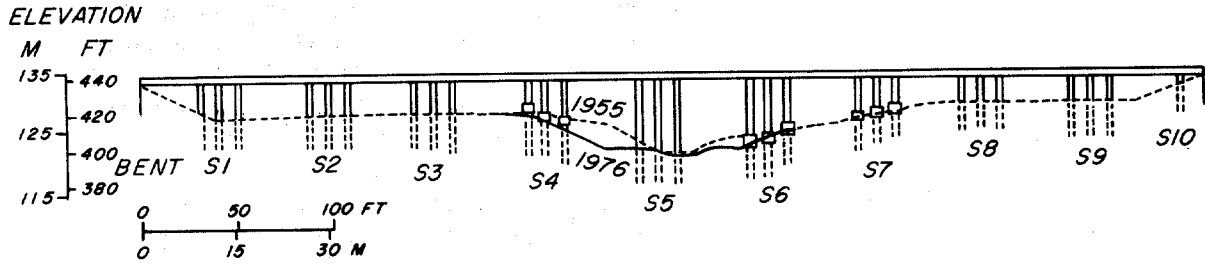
Elevation sketch of south bridge, as projected in a plane normal to flow direction of stream. Collars for strengthening of bent columns are shown.
